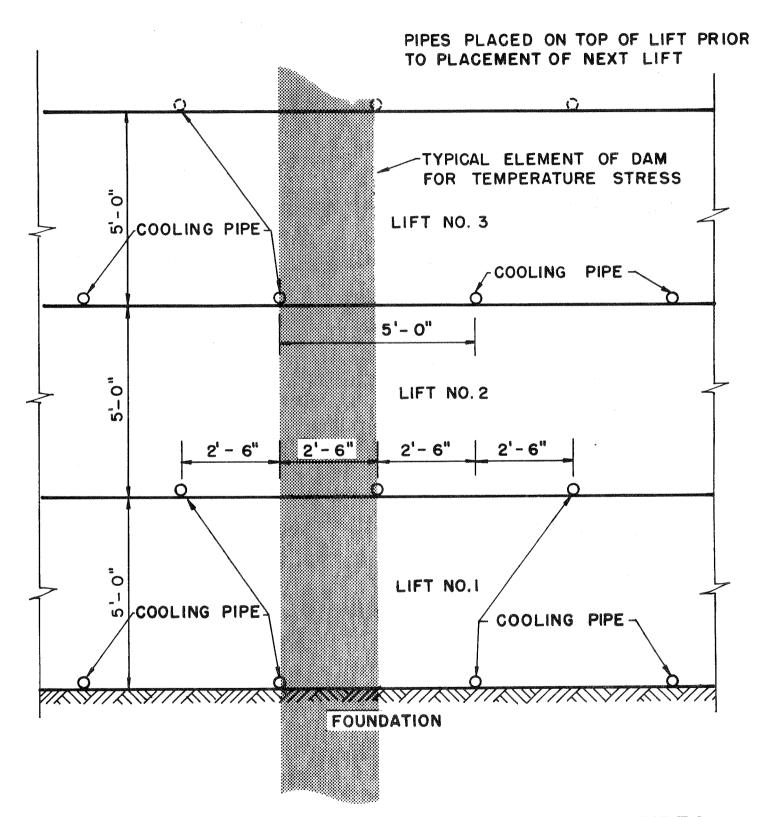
TYPICAL ARRANGEMENT OF COOLING PIPES
